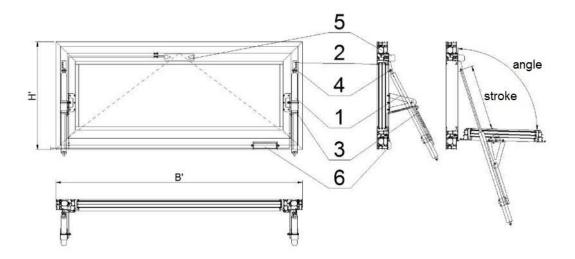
View and cross-sections of an example mcr OSO THERM smoke exhaust window opened to the outside, with spindle actuators on sides.
